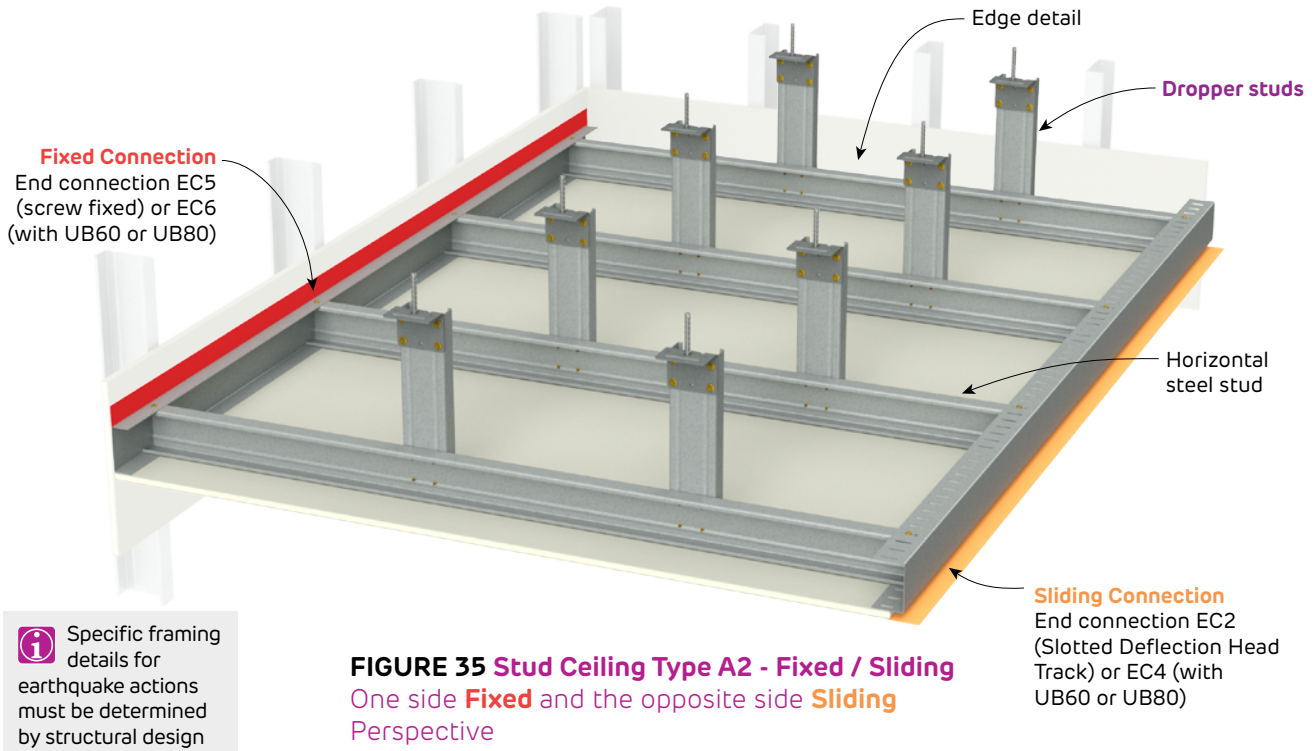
Stud Ceiling Type A2 - Fixed / Sliding
